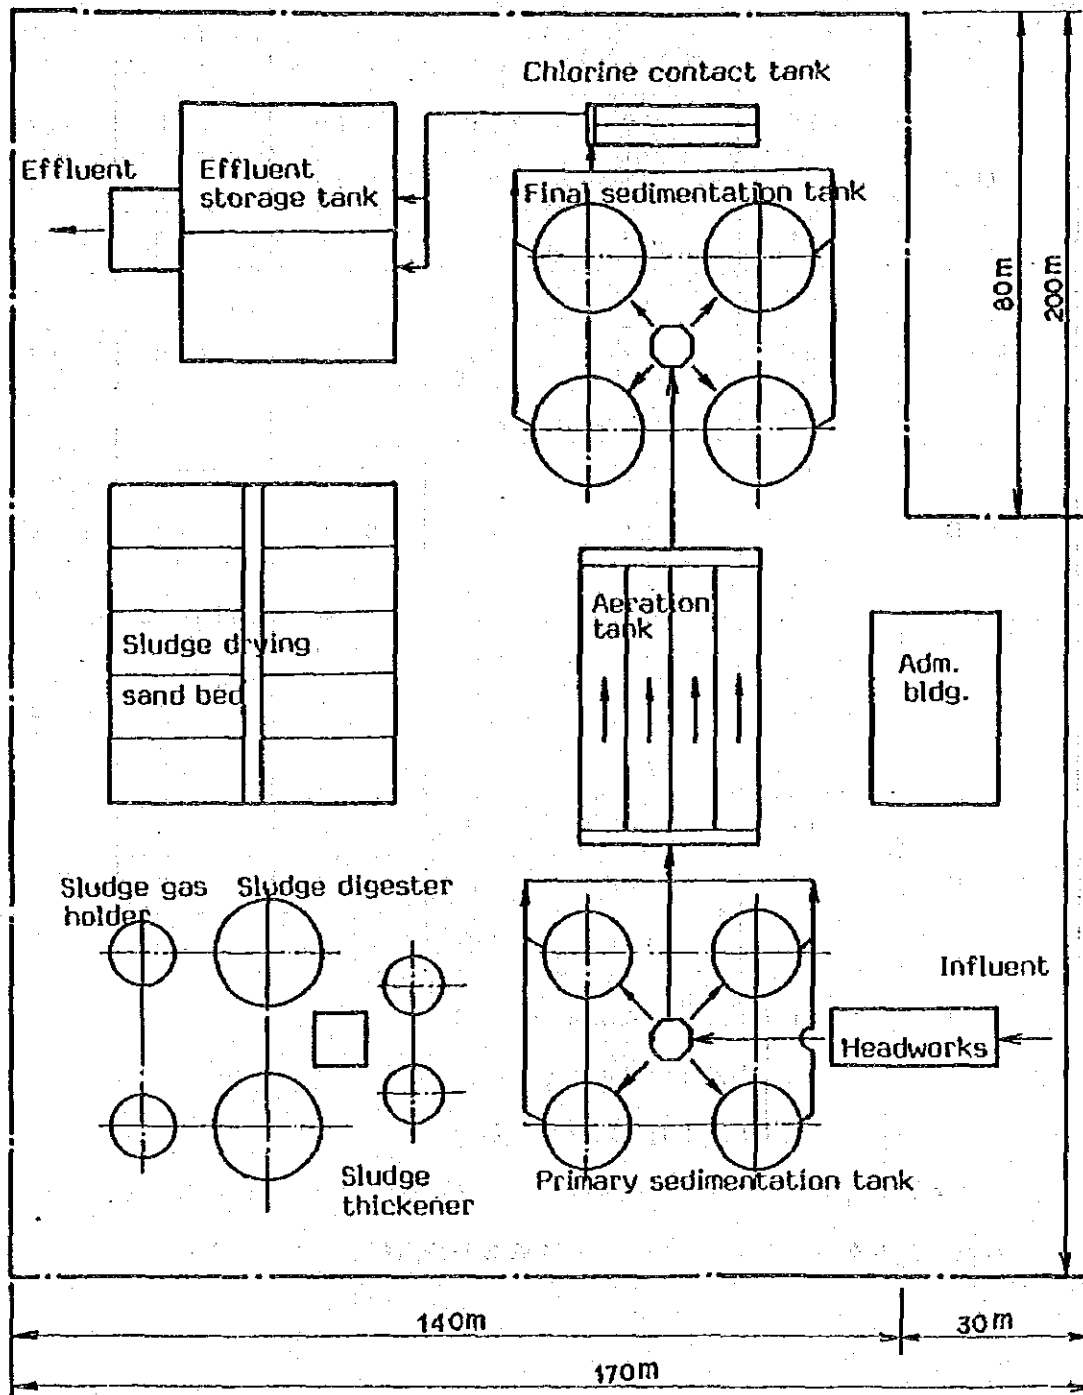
Layout Plan of Conventional Activated Sludge Process
